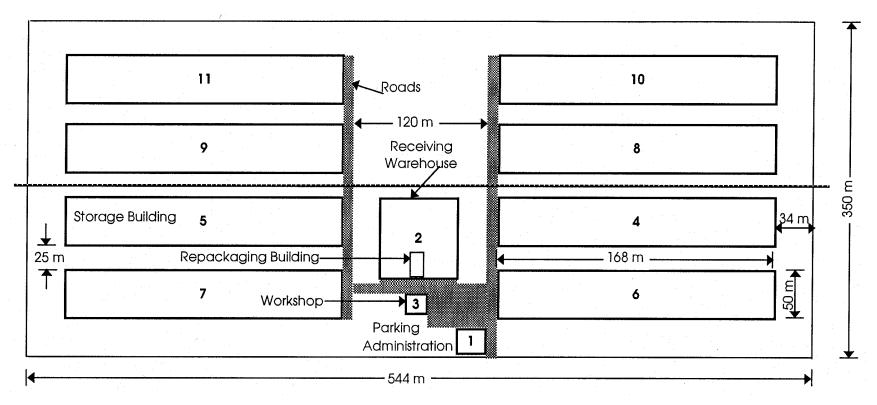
Site Layout of the Building Storage Facility — Uranium Metal, Base (100%) Case
